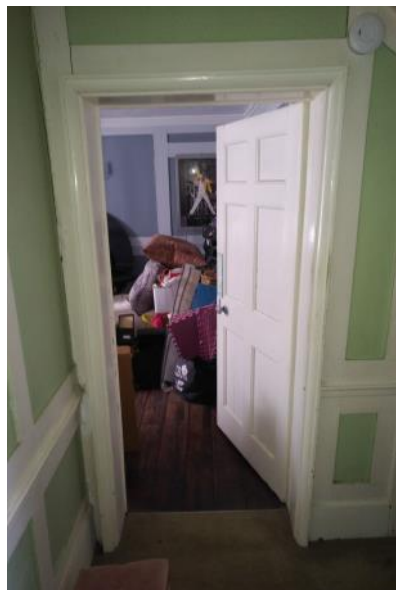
Showing the door from the Main Staircase hallway to the Music Room. Note the internal doorcase.
